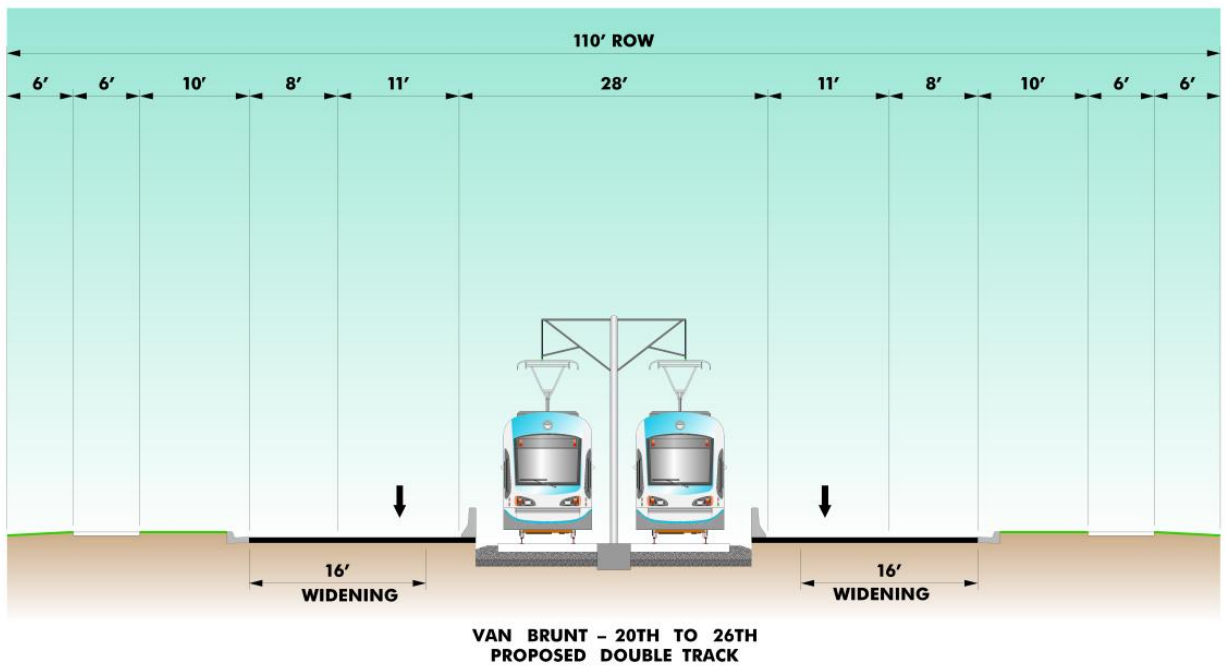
Enhanced Streetcar Truman Road Alignment Typical Section - Van Brunt from 20th-26th Streets
